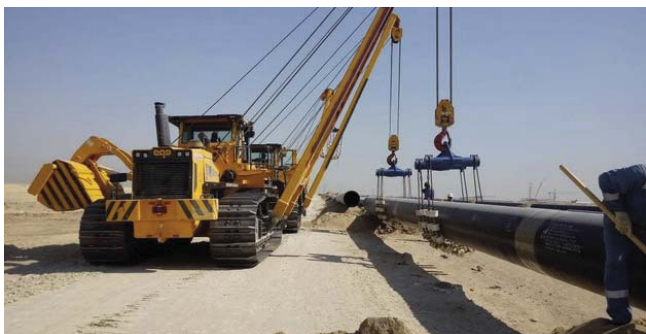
Performer 980 working in harsh conditions with desert sand and temperatures up to 52°C.
